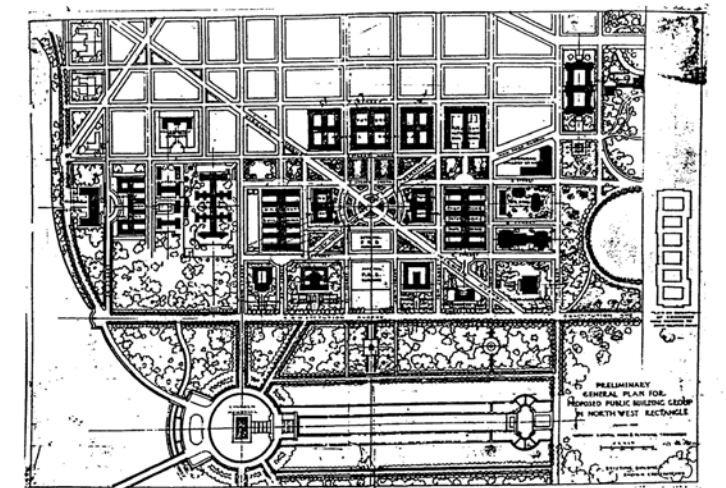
F. Plan of the Northwest Rectangle, 1935, National Capital Park and Planning Commission. The War Department buildings mirror those of the Interior Department on either side of the intersection of New York and Virginia avenues. (Reproduced in Short and Ford Architects, "Historic Structure Report and Preservation Manual for Department of State: Final Report," August 1990, 61.)
